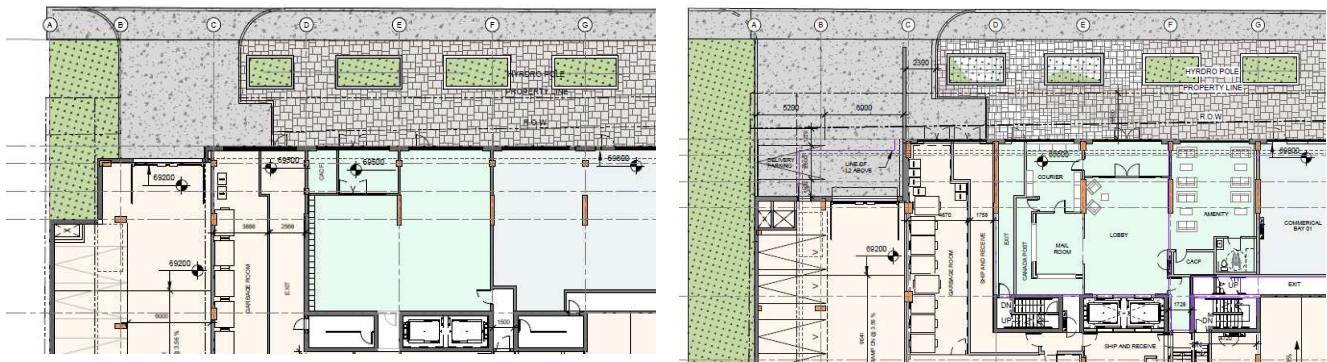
Ground floor of Submission 1 (left) and Submission 2 (right) comparing how the entrance to the parking garage and ground floor has changed.
